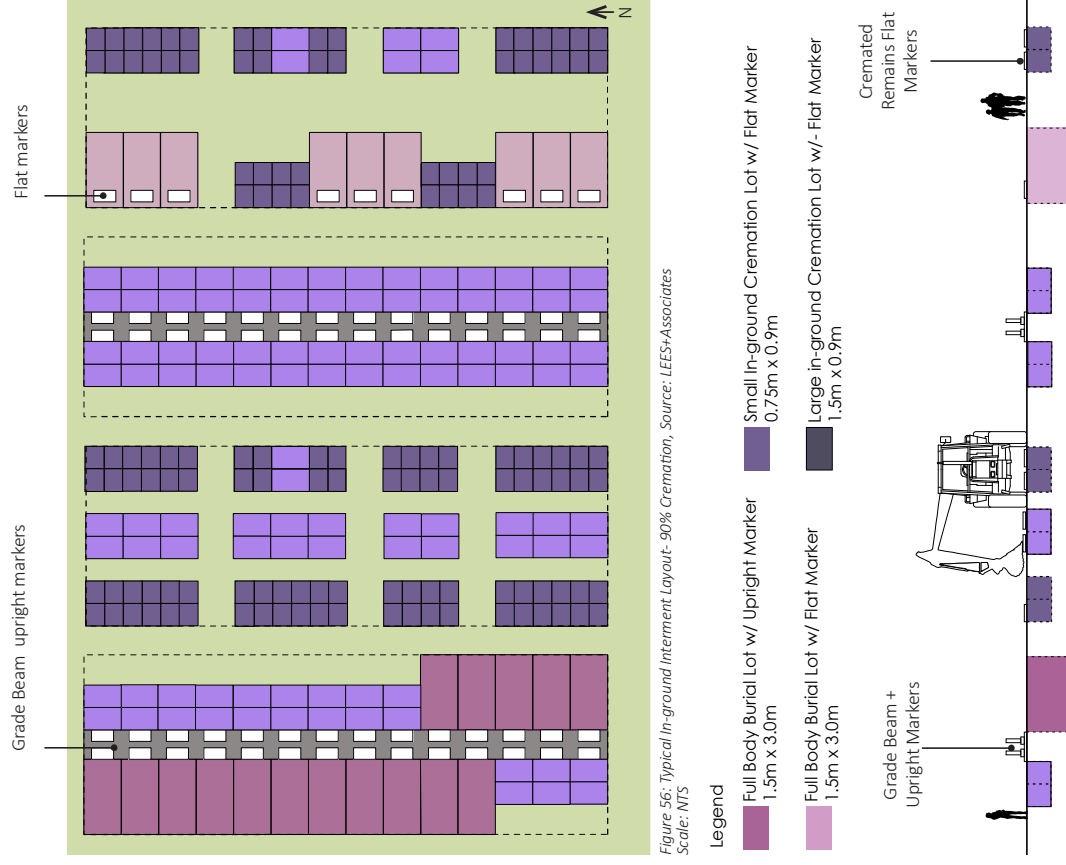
Typical In-ground Interment Layout Section - 90% Cremation, Source: LEES+Associates
